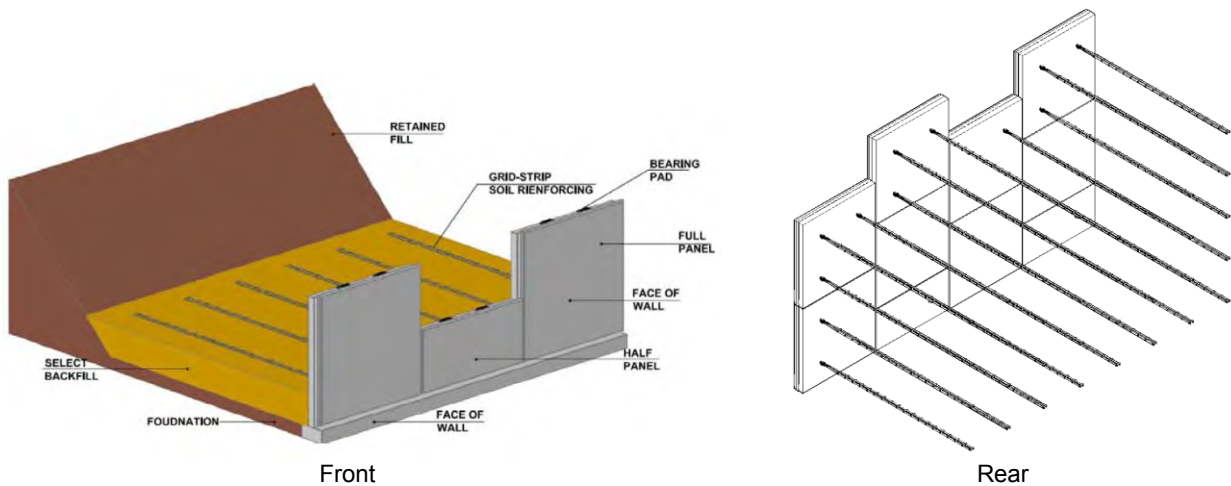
Isometric view of MSEW System-2 showing front and rear faces.
